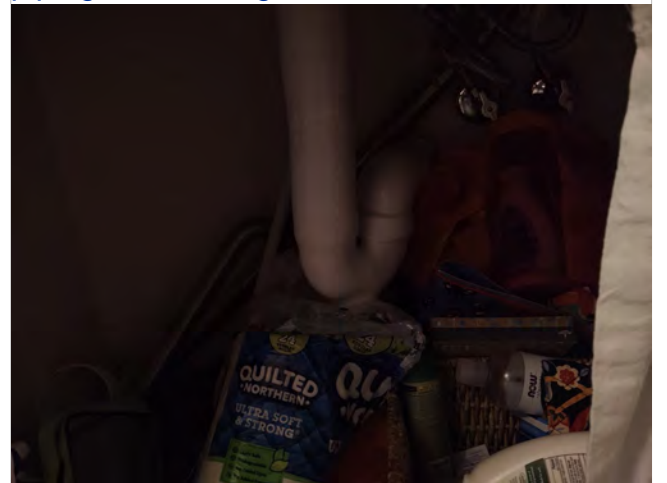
Dwelling Unit #107 - Exposed piping beneath kitchen sink.
